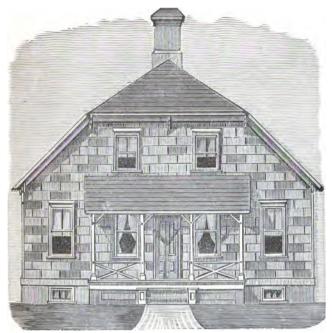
ELEVATION OF FRONT OF HOUSE.
